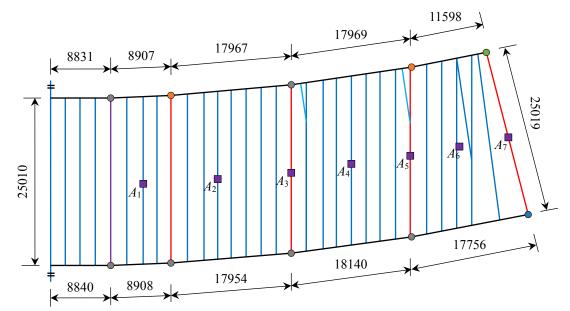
Outline of prestressed concrete floor #4 (all dimensions in mm)
